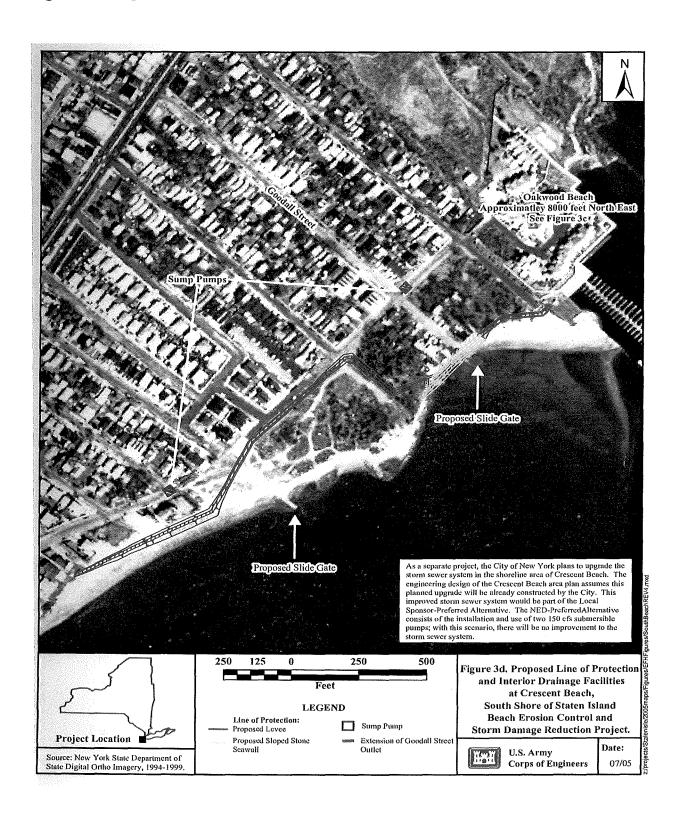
Proposed Line of Protection and Interior Drainage Facilities at Crescent Beach
